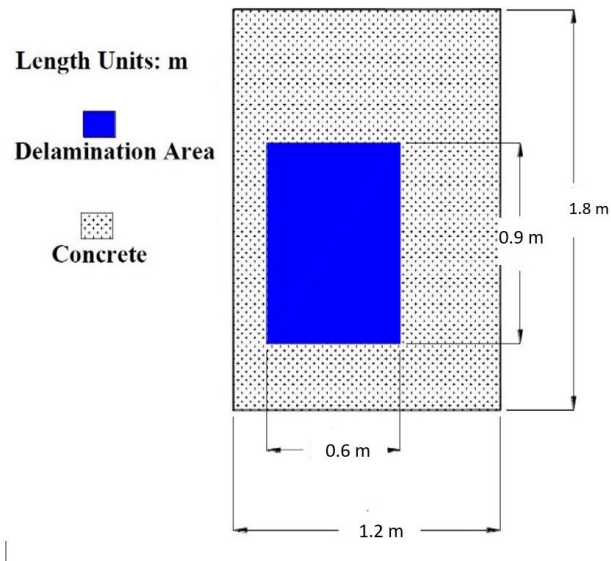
The Plan and Elevation View of the Deck and its Delamination, (E003)
